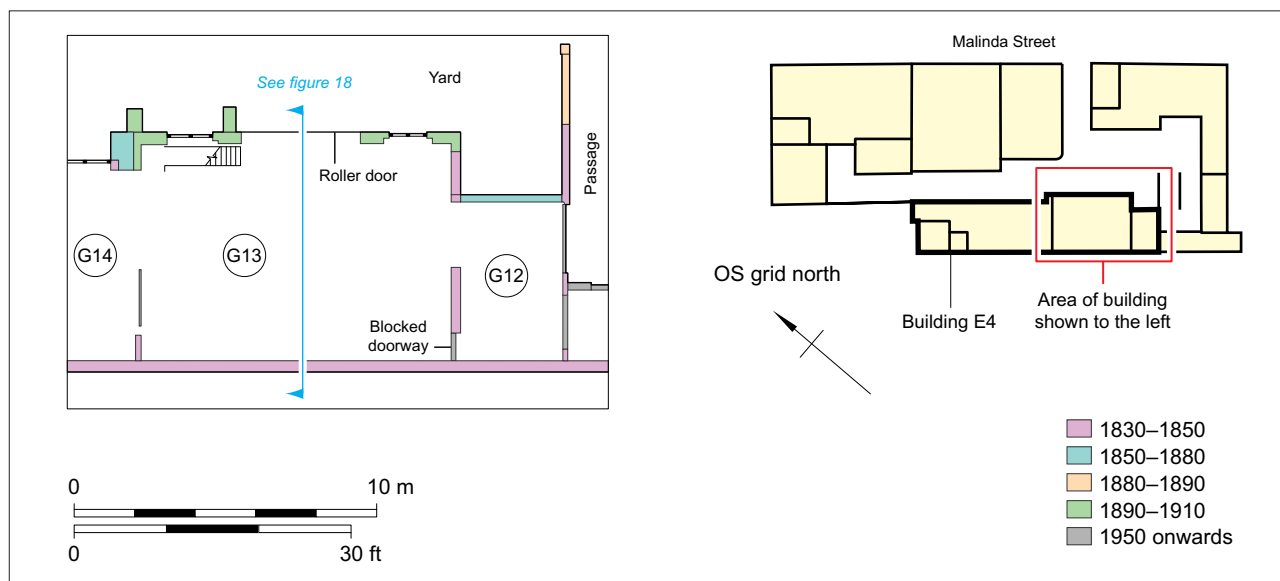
Malinda Works, plan of building E4 rooms G14, G13 and G12
